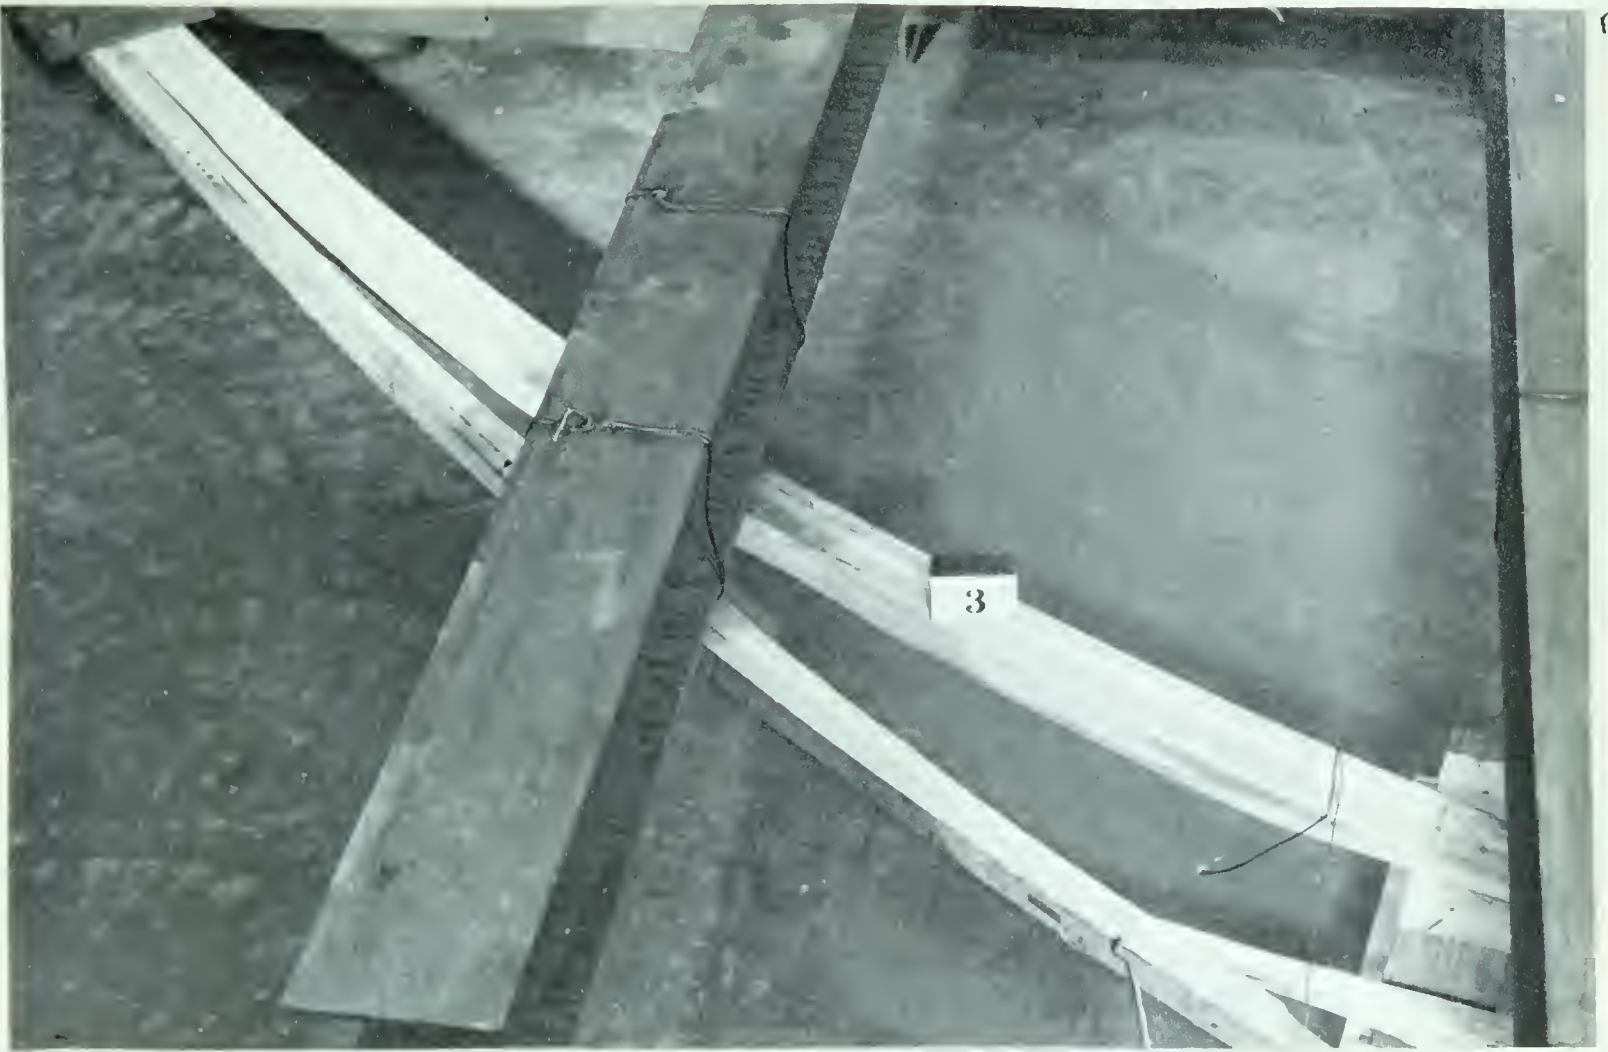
View of Failure in Arch Specimen No. 3.
